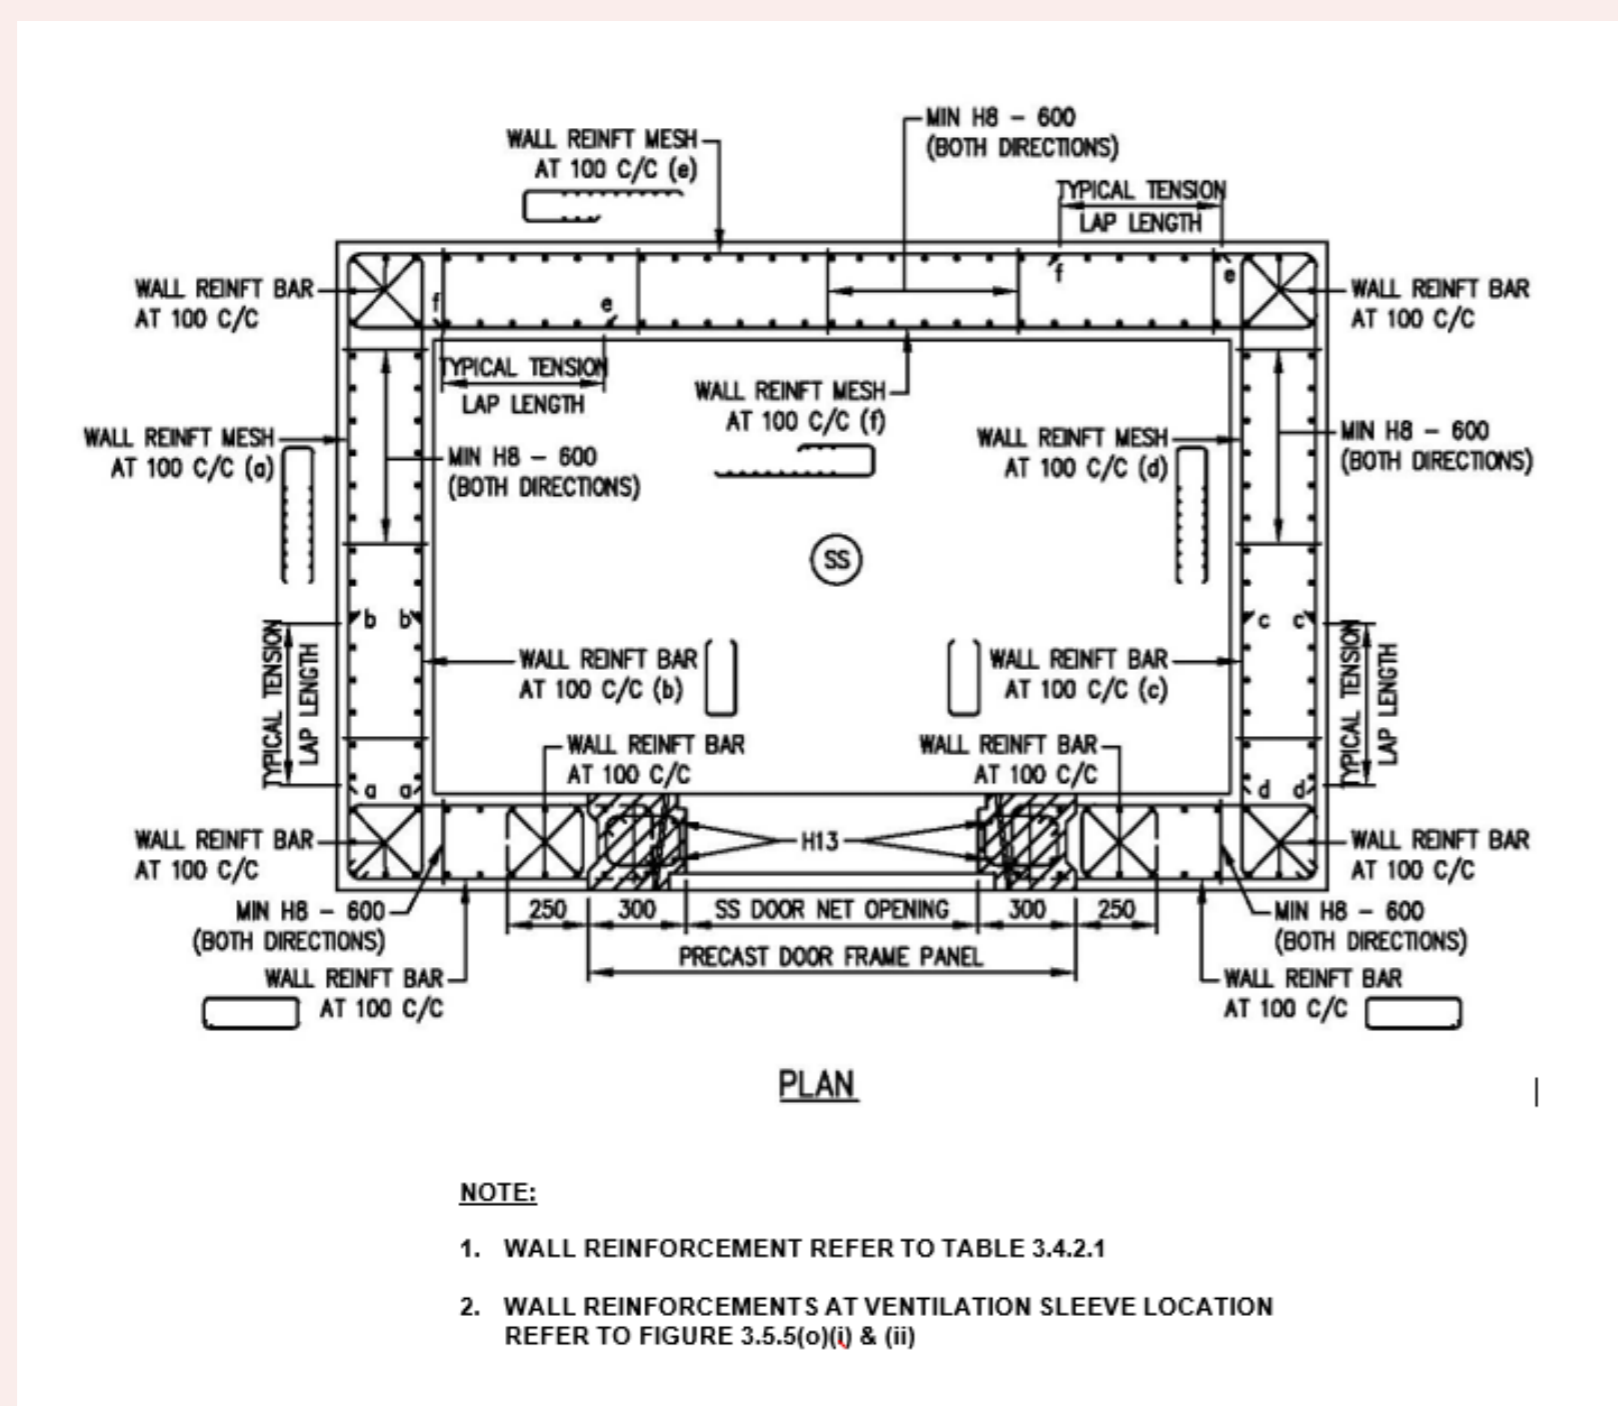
(b): DETAILS AND SECTIONS OF PRECAST SS DOOR FRAME PANEL WITH VENTILATION SLEEVE ABOVE IT (TYPE 1)
